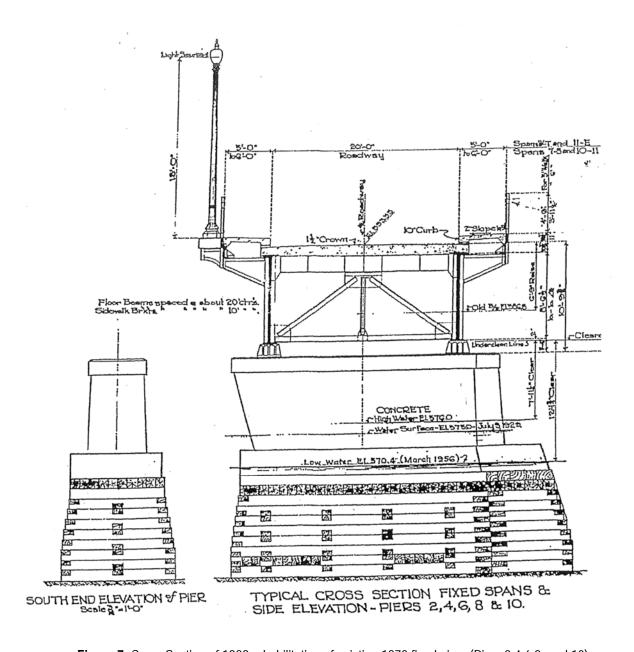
Cross Section of 1929 rehabilitation of existing 1873 fixed piers (Piers 2,4,6,8, and 10)
